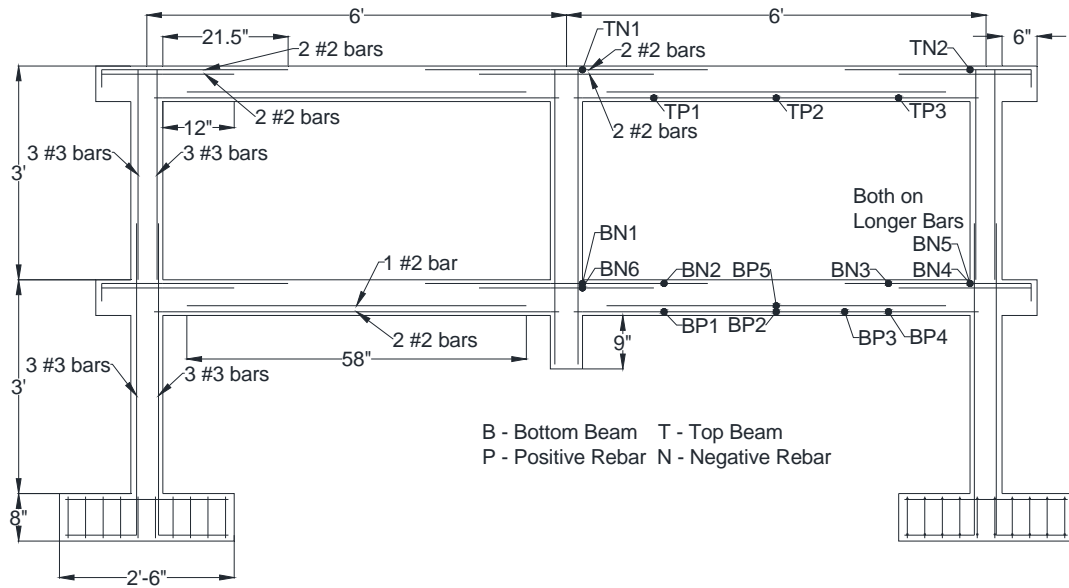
Strain gage layout for test frames with discontinuous reinforcement
